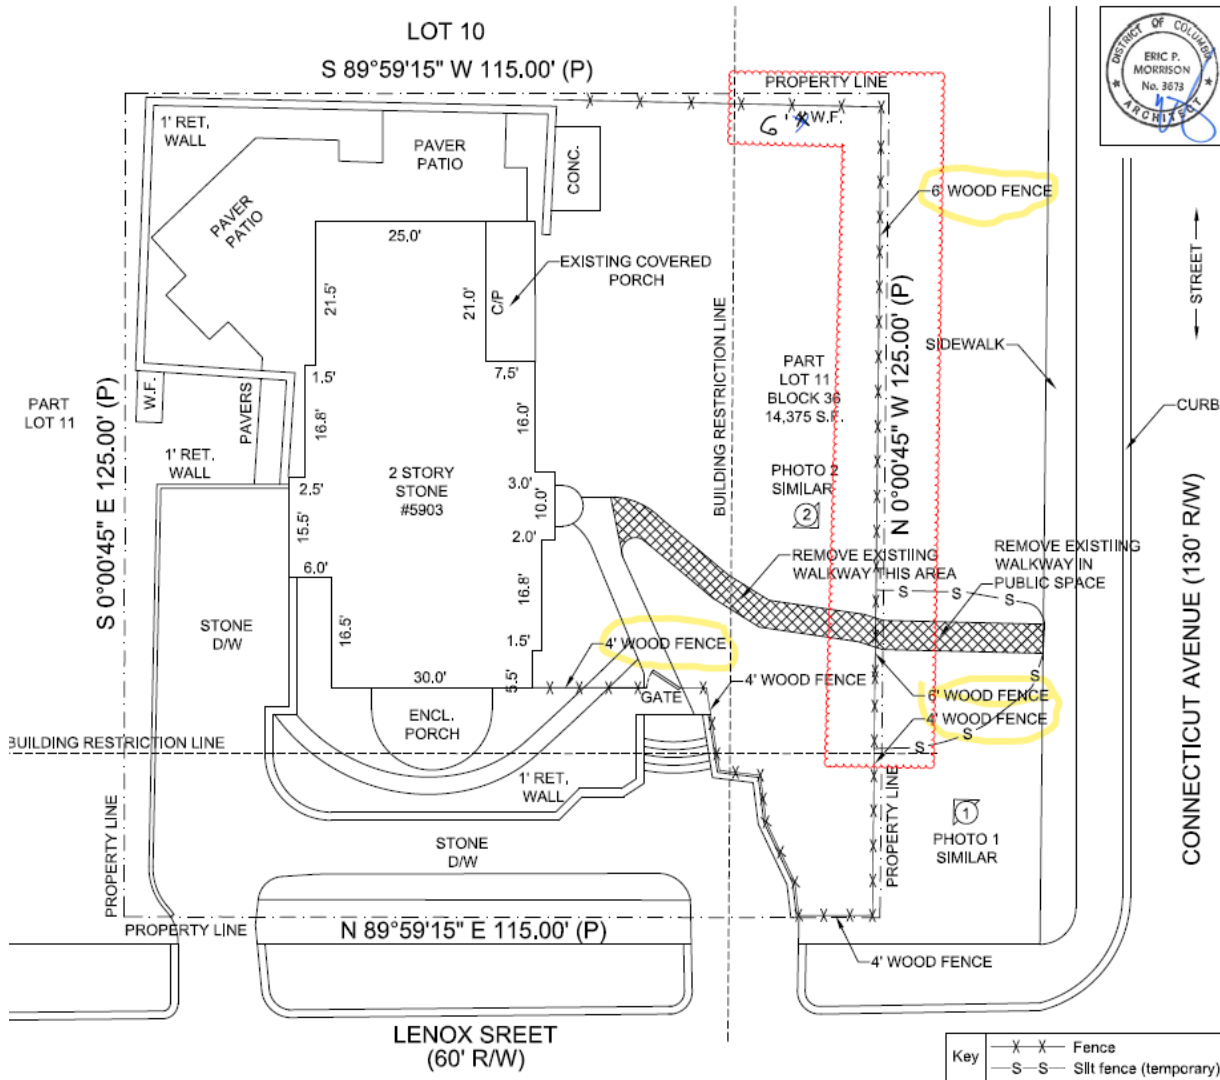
Site plan, with fencing requiring a variance clouded in red.
